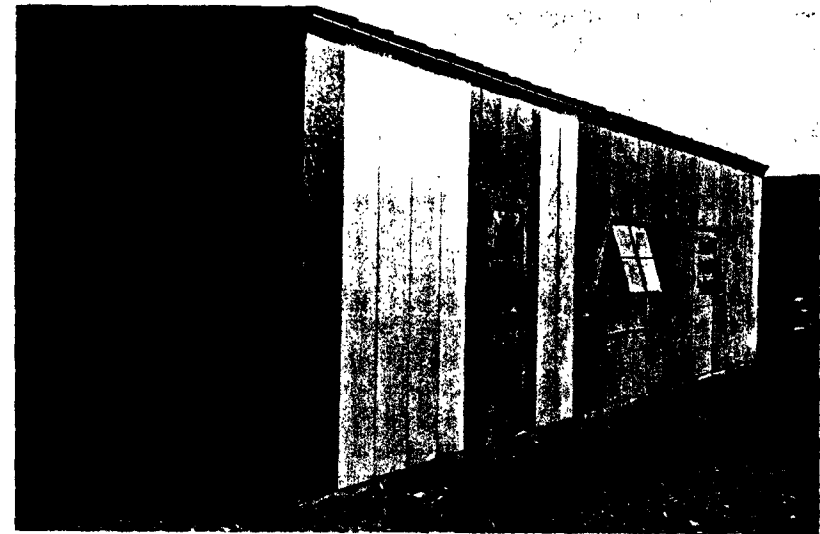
Exterior of self-framing steel panel building before a nuclear explosion, Nevada Test Site.
